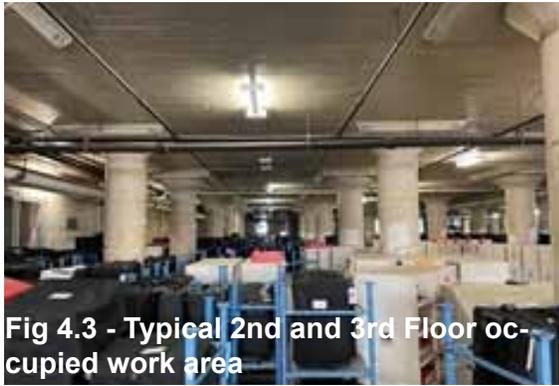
Typical 2nd and 3rd Floor occupied work area
